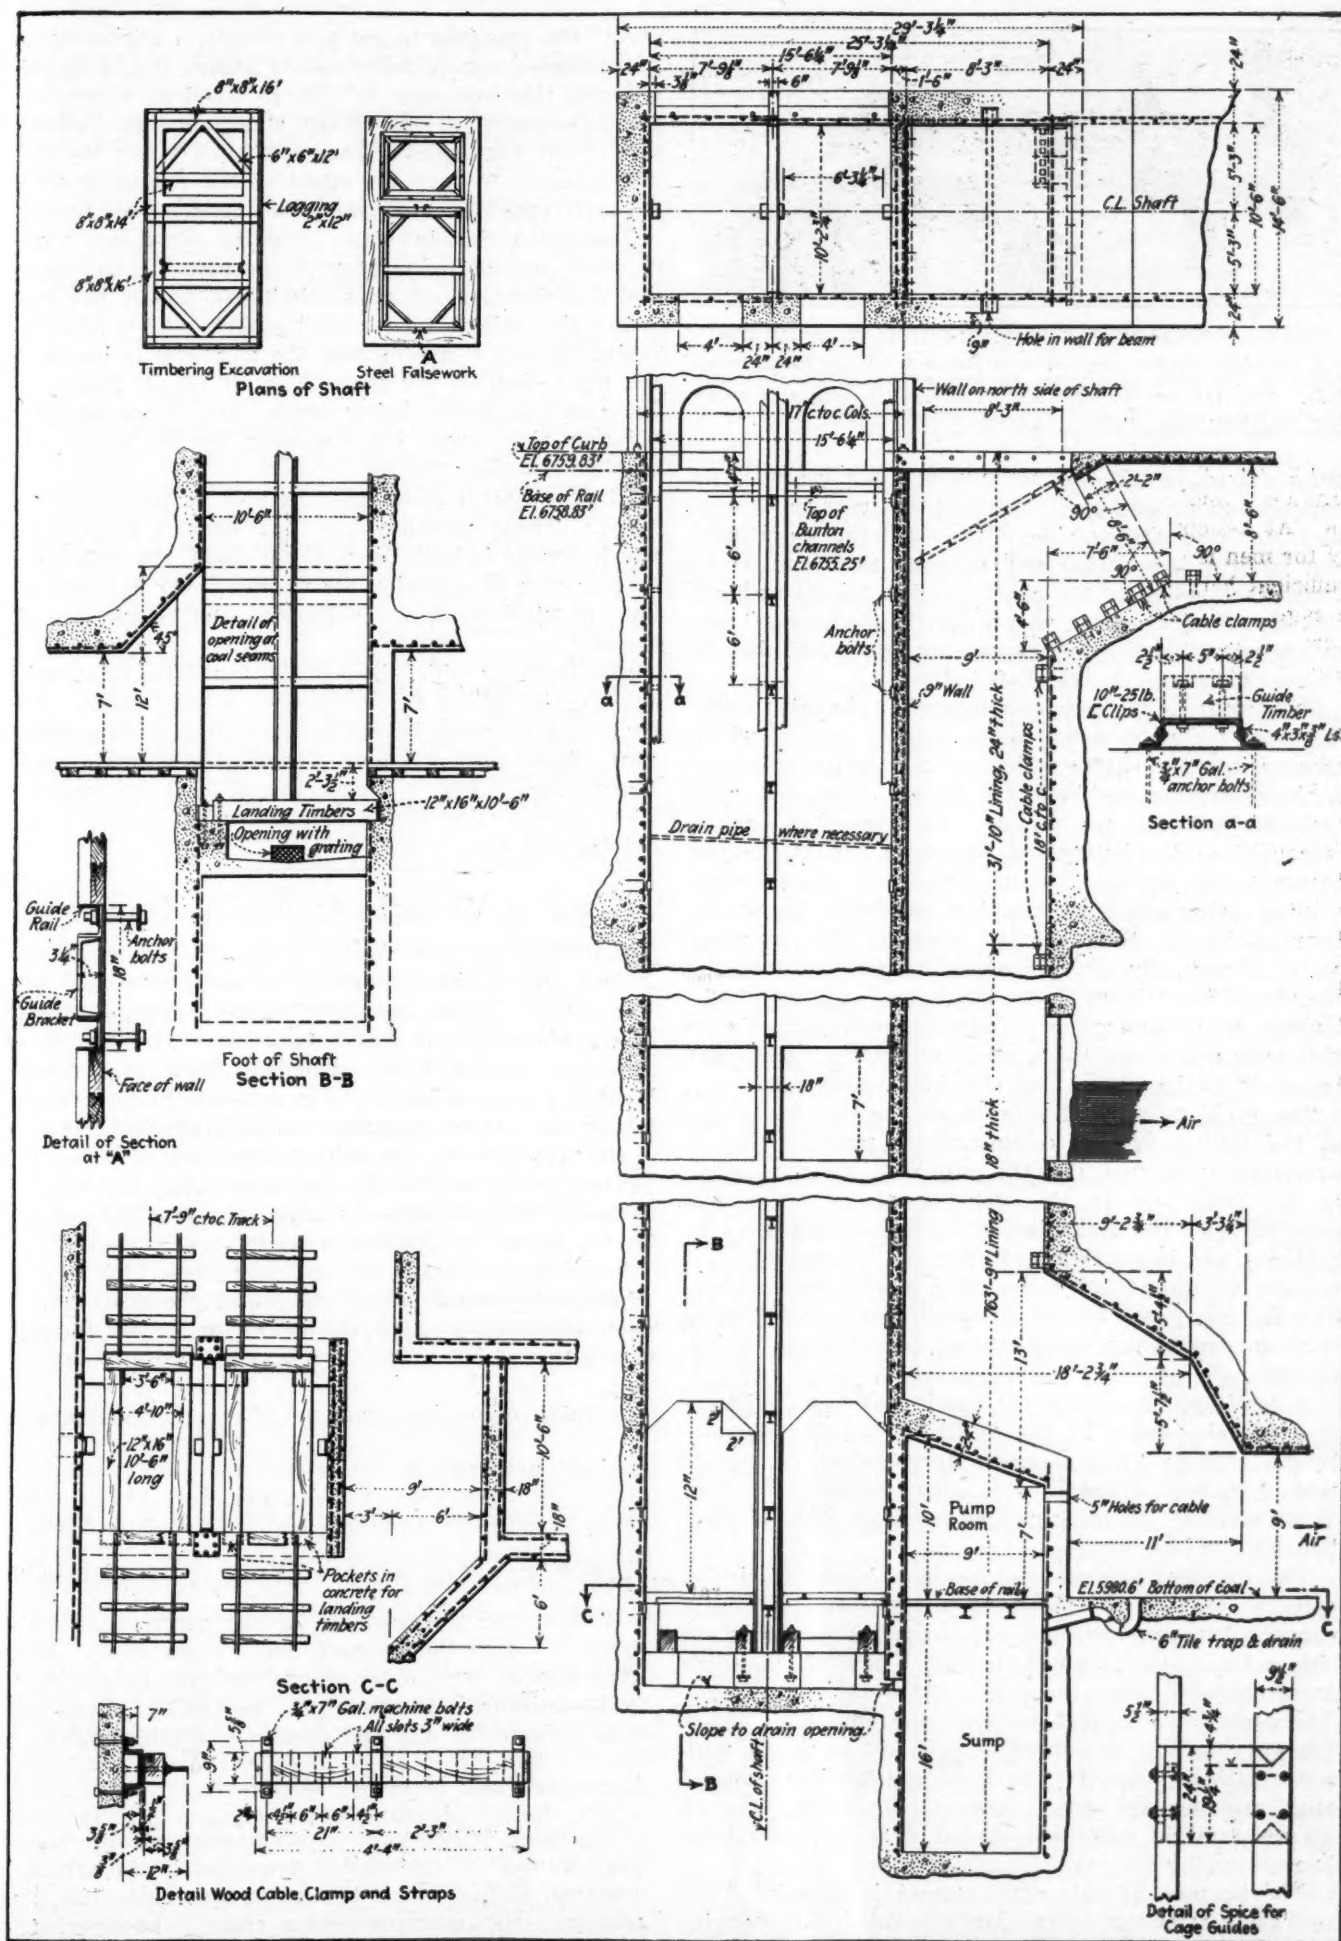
CROSS-SECTIONS AND DETAILS OF MAN-AND-MATERIAL SHAFT SHOWING BOTH COMPLETED AND FALSE WORK
